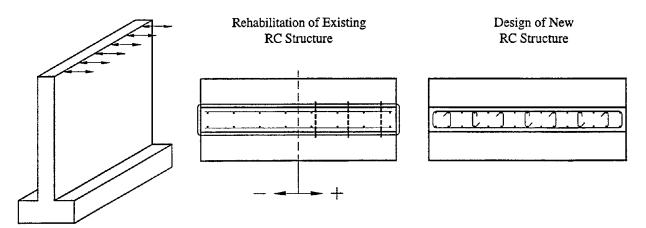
Design detailing for the seismic retrofit of rectangular columns/pier walls
